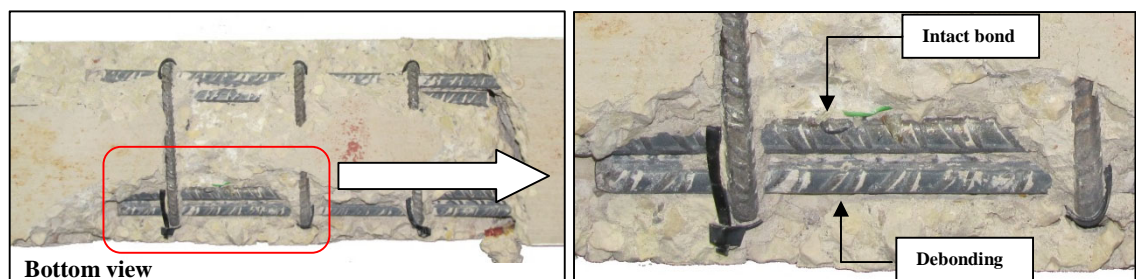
Loss of bond between concrete and steel bar of specimen LC20-D12-S
